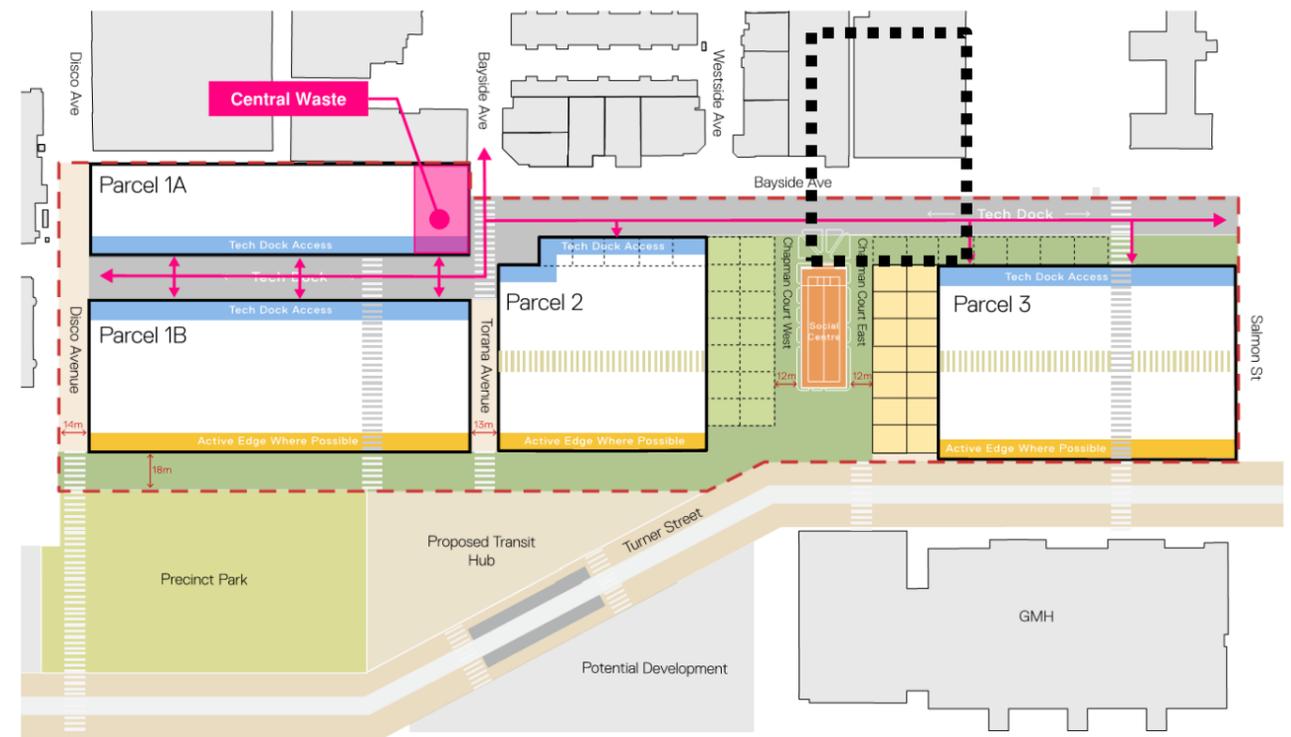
Proposed location of central waste facility as part of the Stage 1 development
